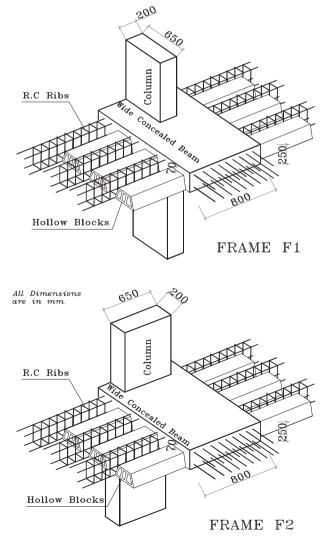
Typical RC ribbed slab-wide concealed beam systems for exterior joints.
